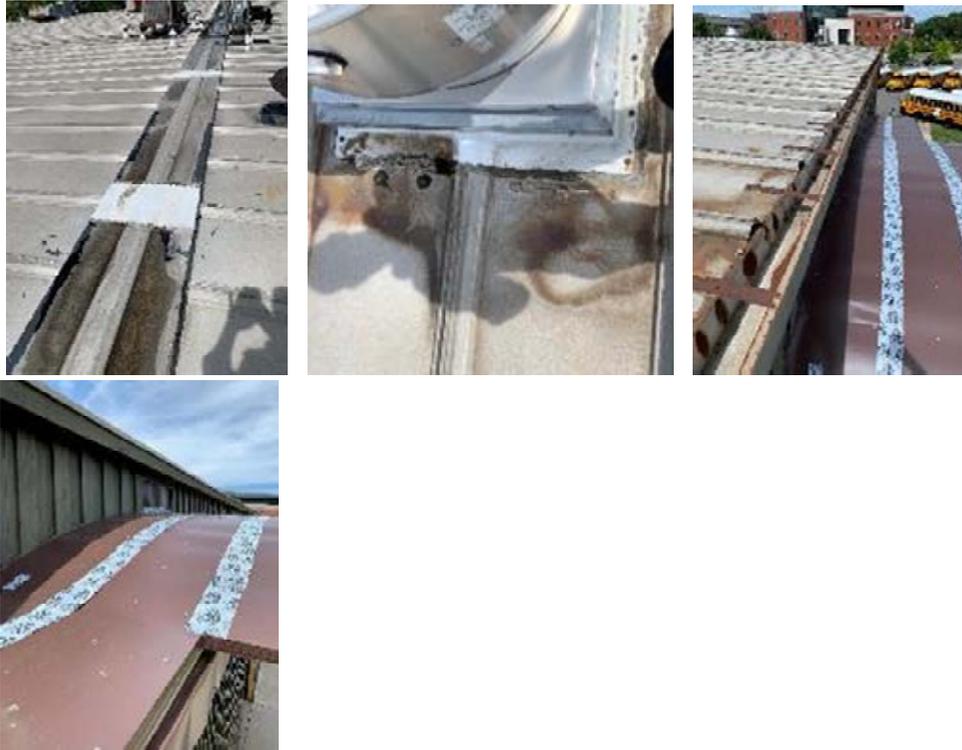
Roof – Leaks, corroded seams and surfaces, gutter detail and incomplete canopy
